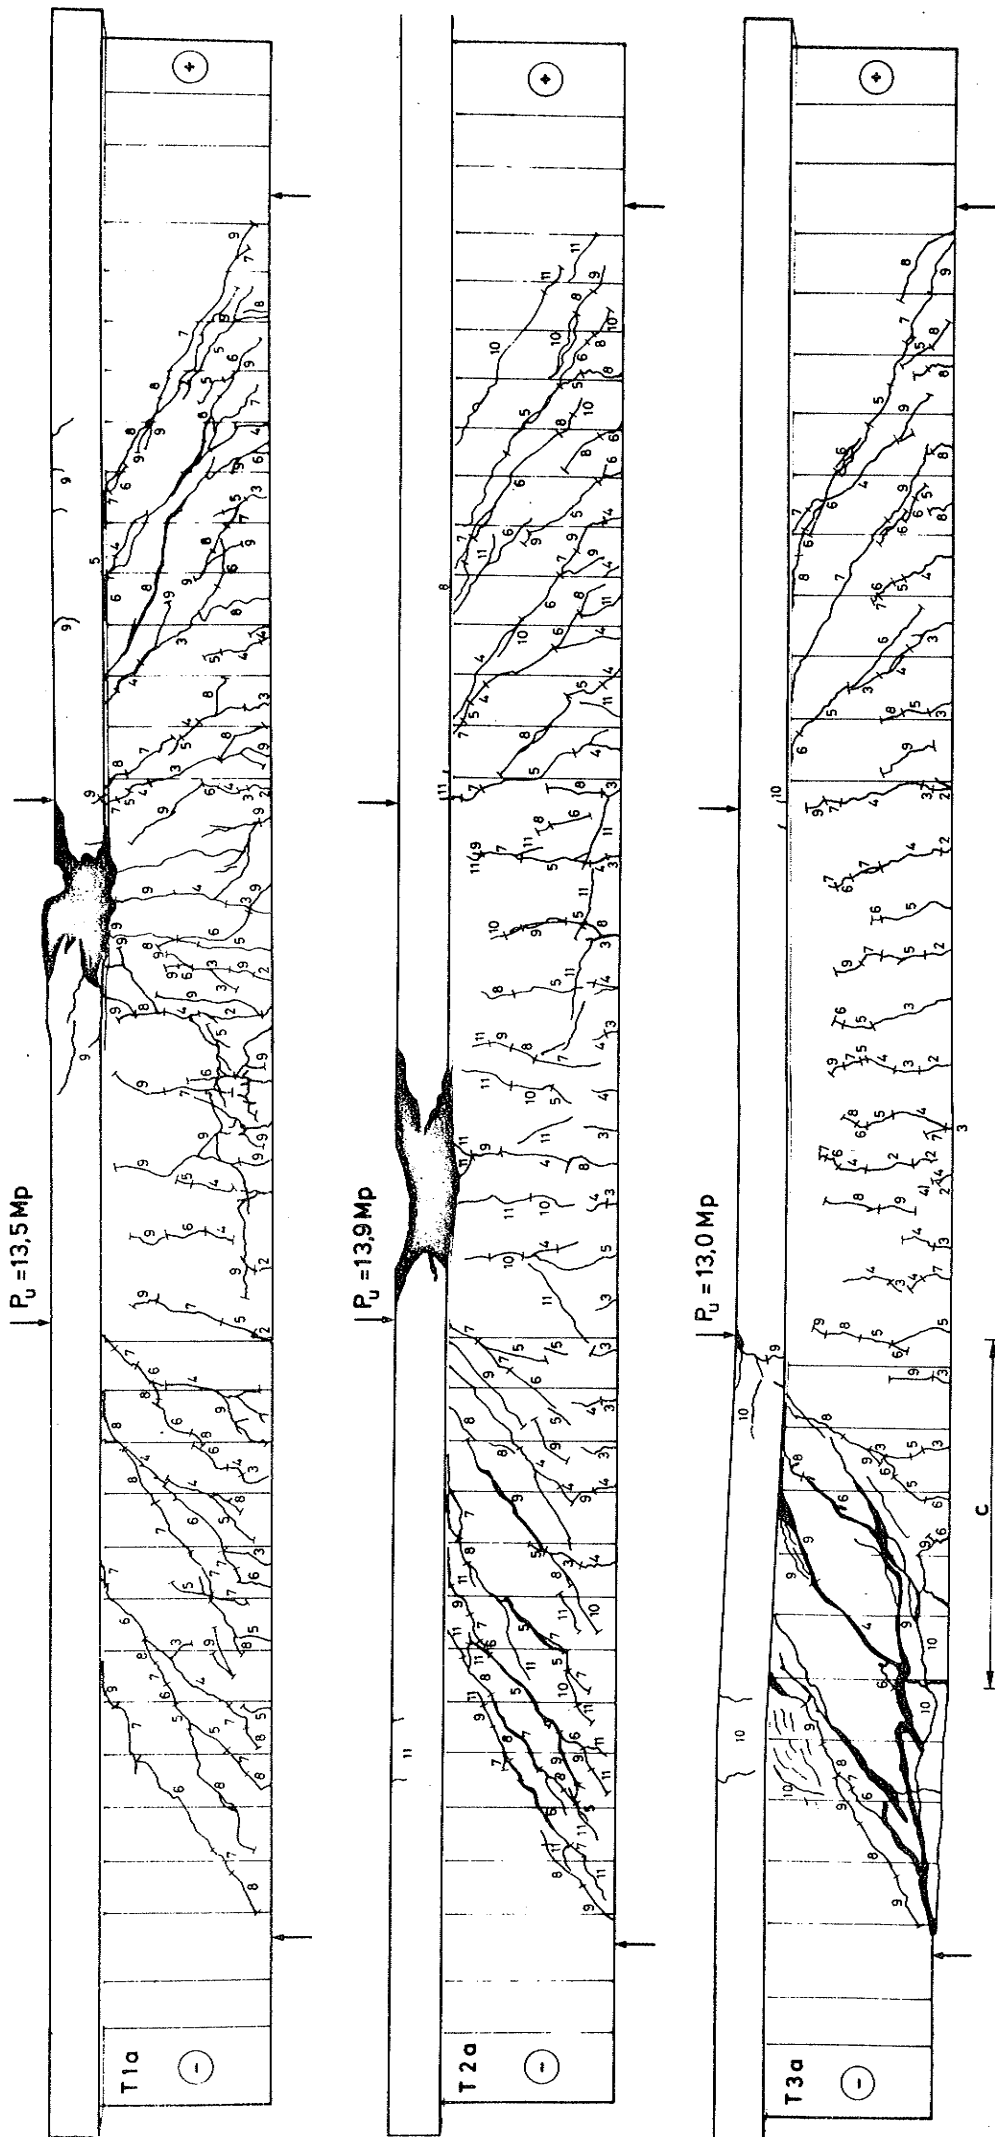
Crack pattern after failure, beam T1a, T2a, T3a
